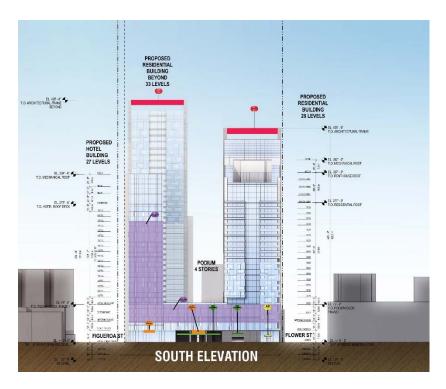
Alternative A Sign Dimensions and Locations – South Elevation
